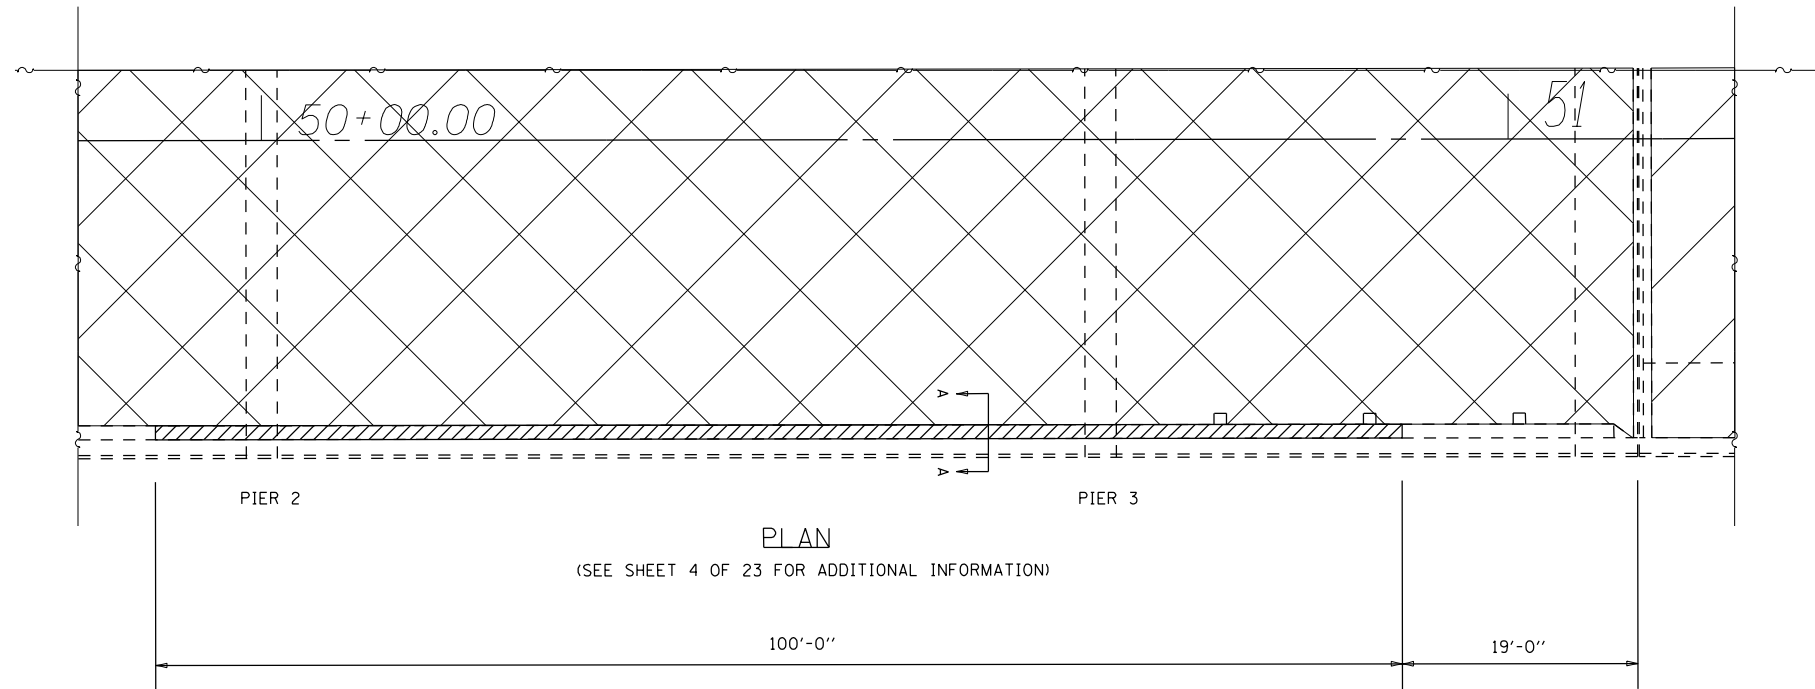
DETAIL STRUCTURAL REPAIR OF CONCRETE
